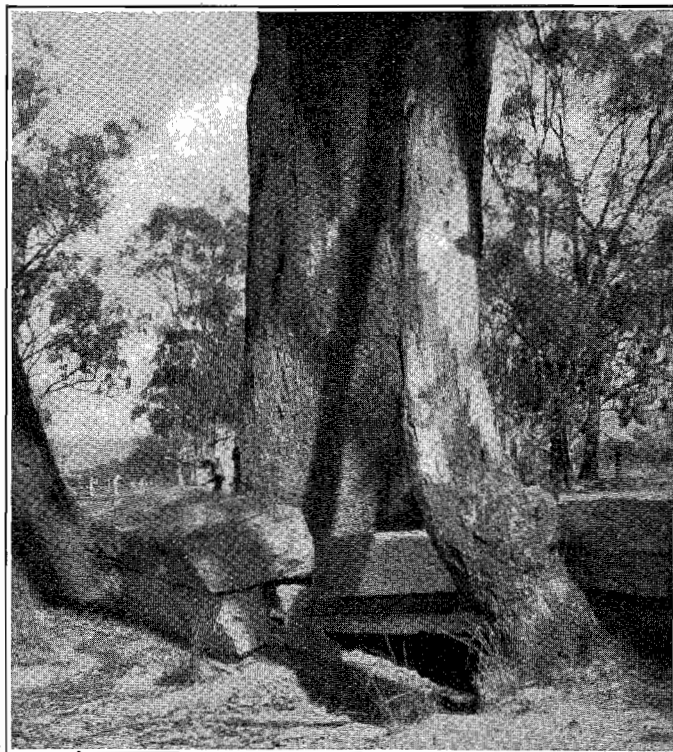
Trees estimated to be over 60 years old growing out of abutment of stone culvert, North-Eastern Highway.
